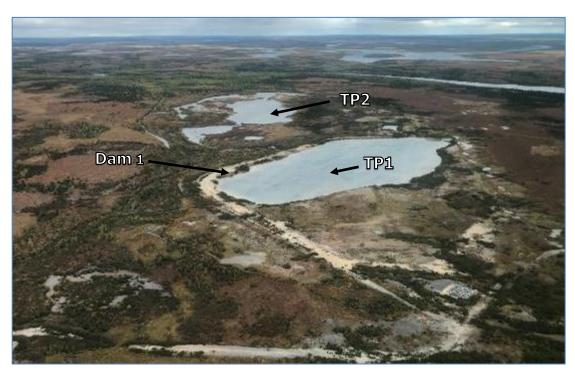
Aerial view of TP1 and TP2 (looking southeast).
